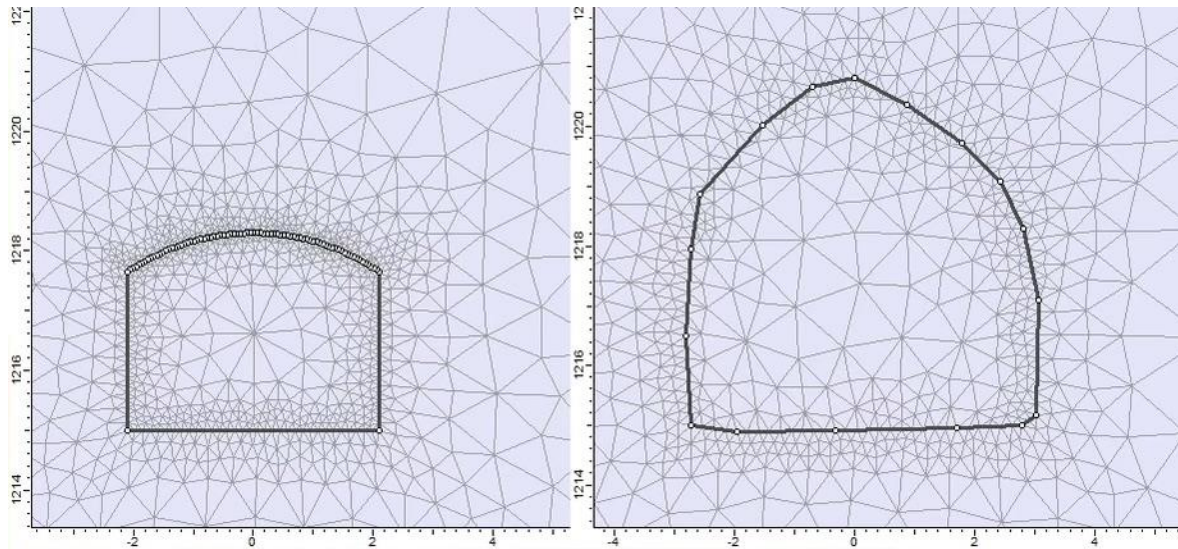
Intended cross-section compared to the actual cross-section in the weakness zone. Excavation boundaries based on the construction drawings in Figure 19.
